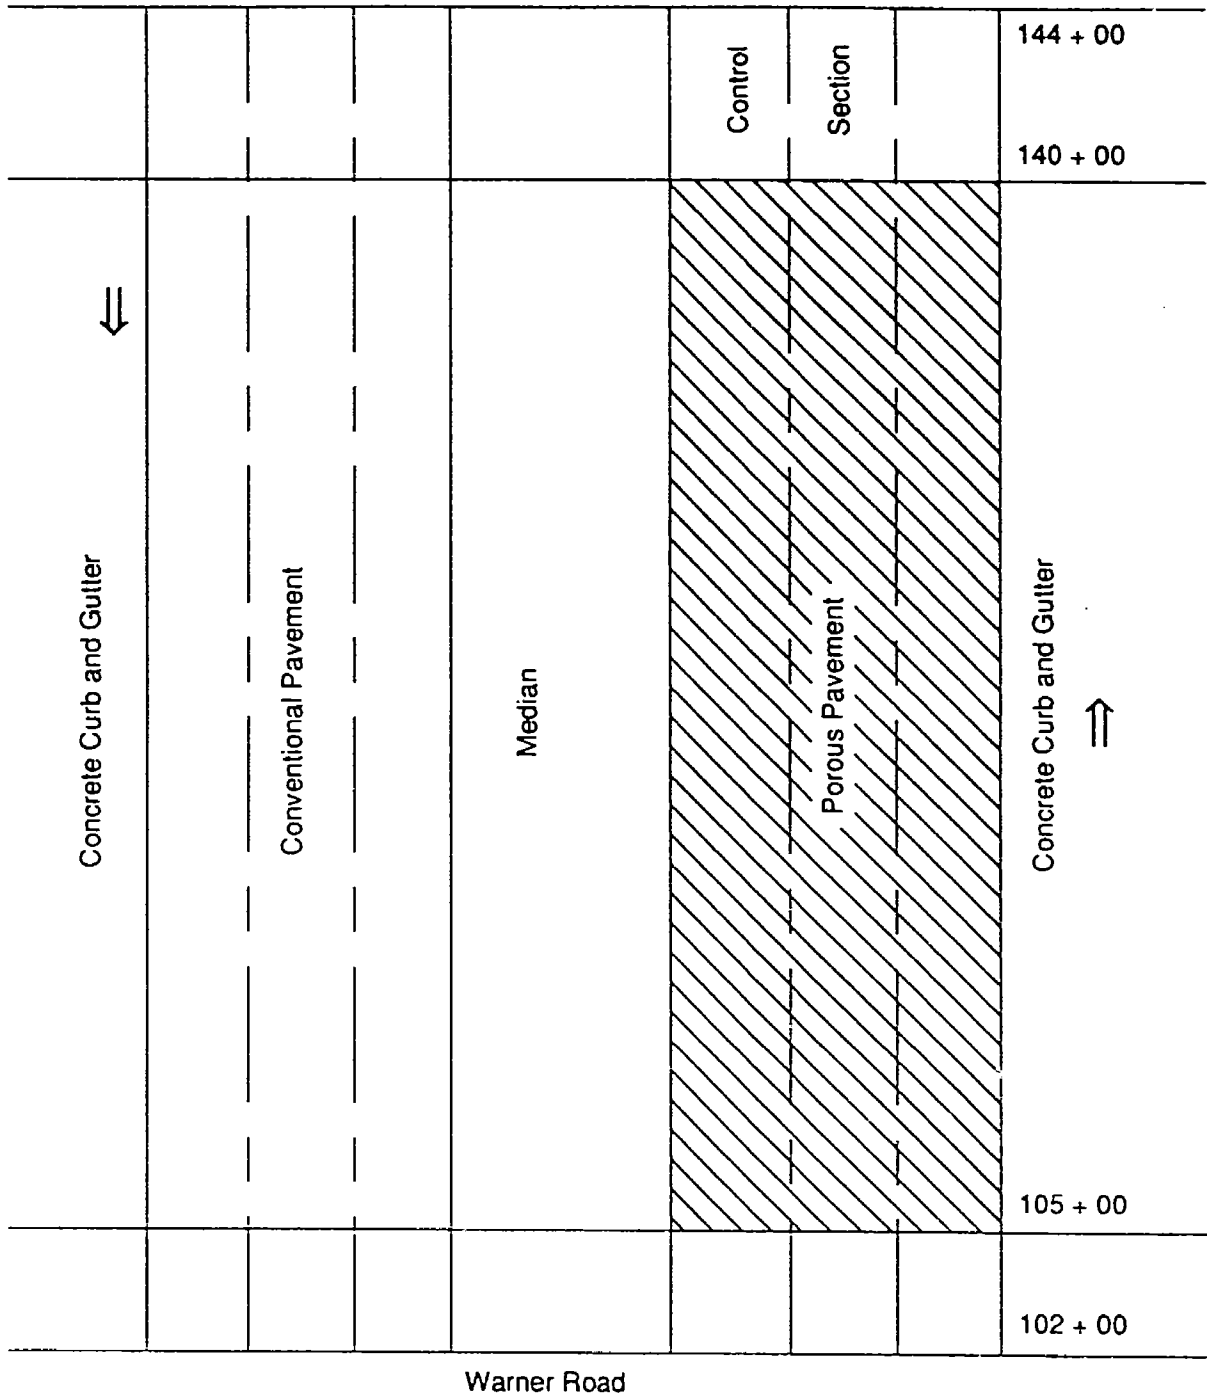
LAYOUT OF POROUS PAVEMENT TEST SECTION
